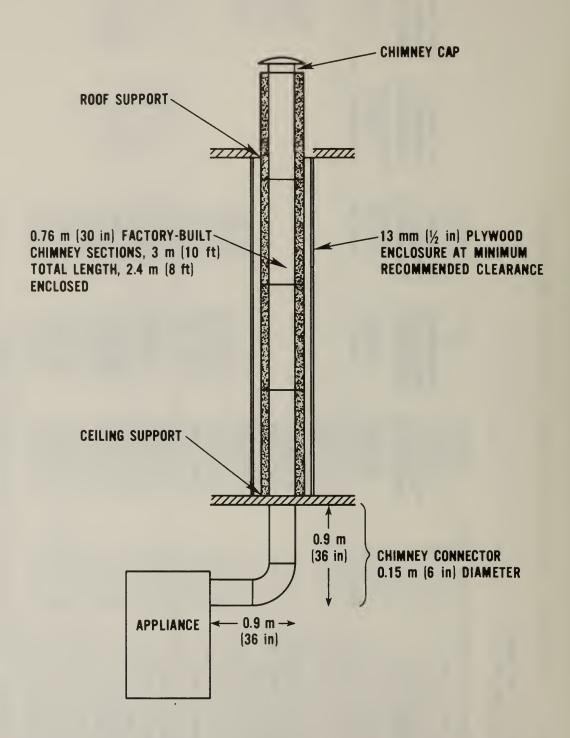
Installation of Factory-Built Chimneys 1, 2, and 4 for Chimney Fire Tests.
